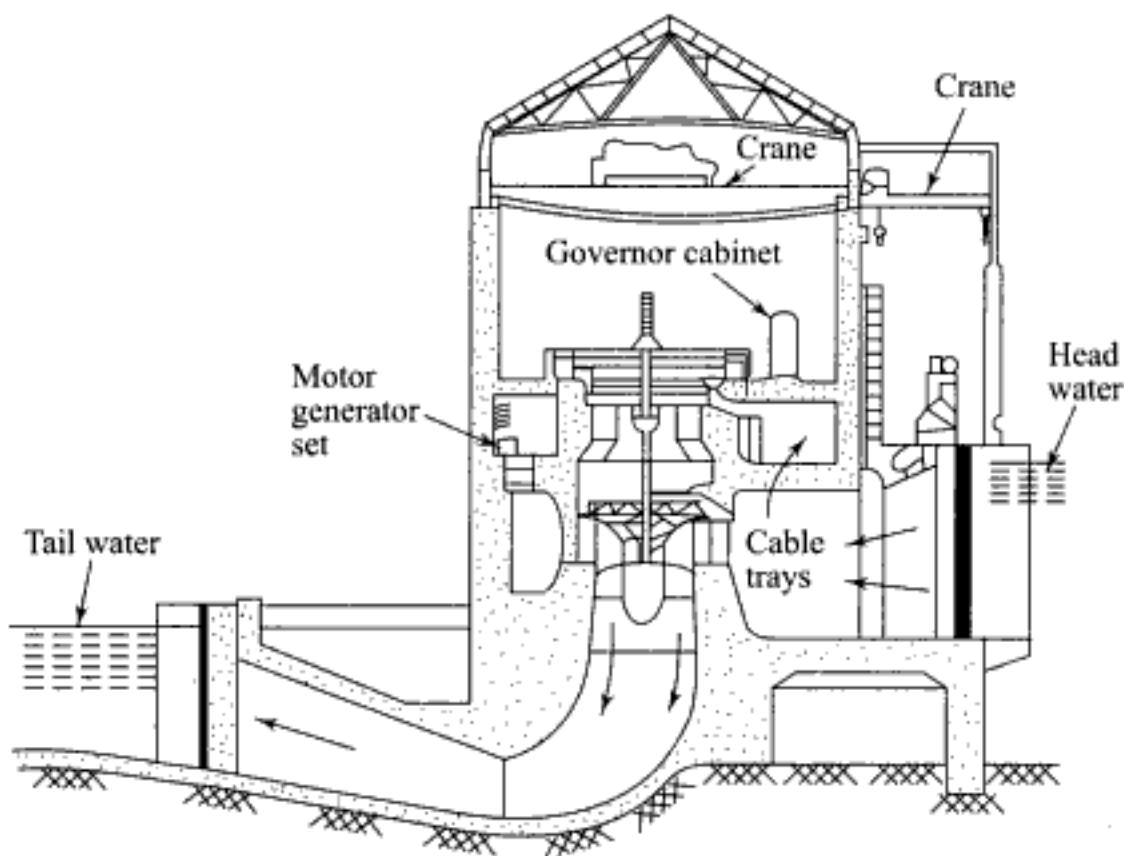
(c) Cross-section of typical low head concrete spiral-case setting with Kaplan turbine
